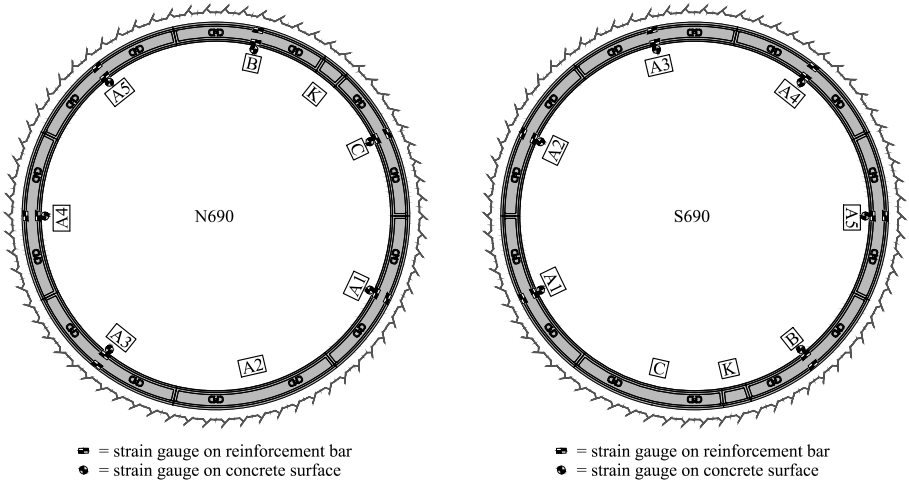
Segment orientation in tunnel sections N690 and S690.
